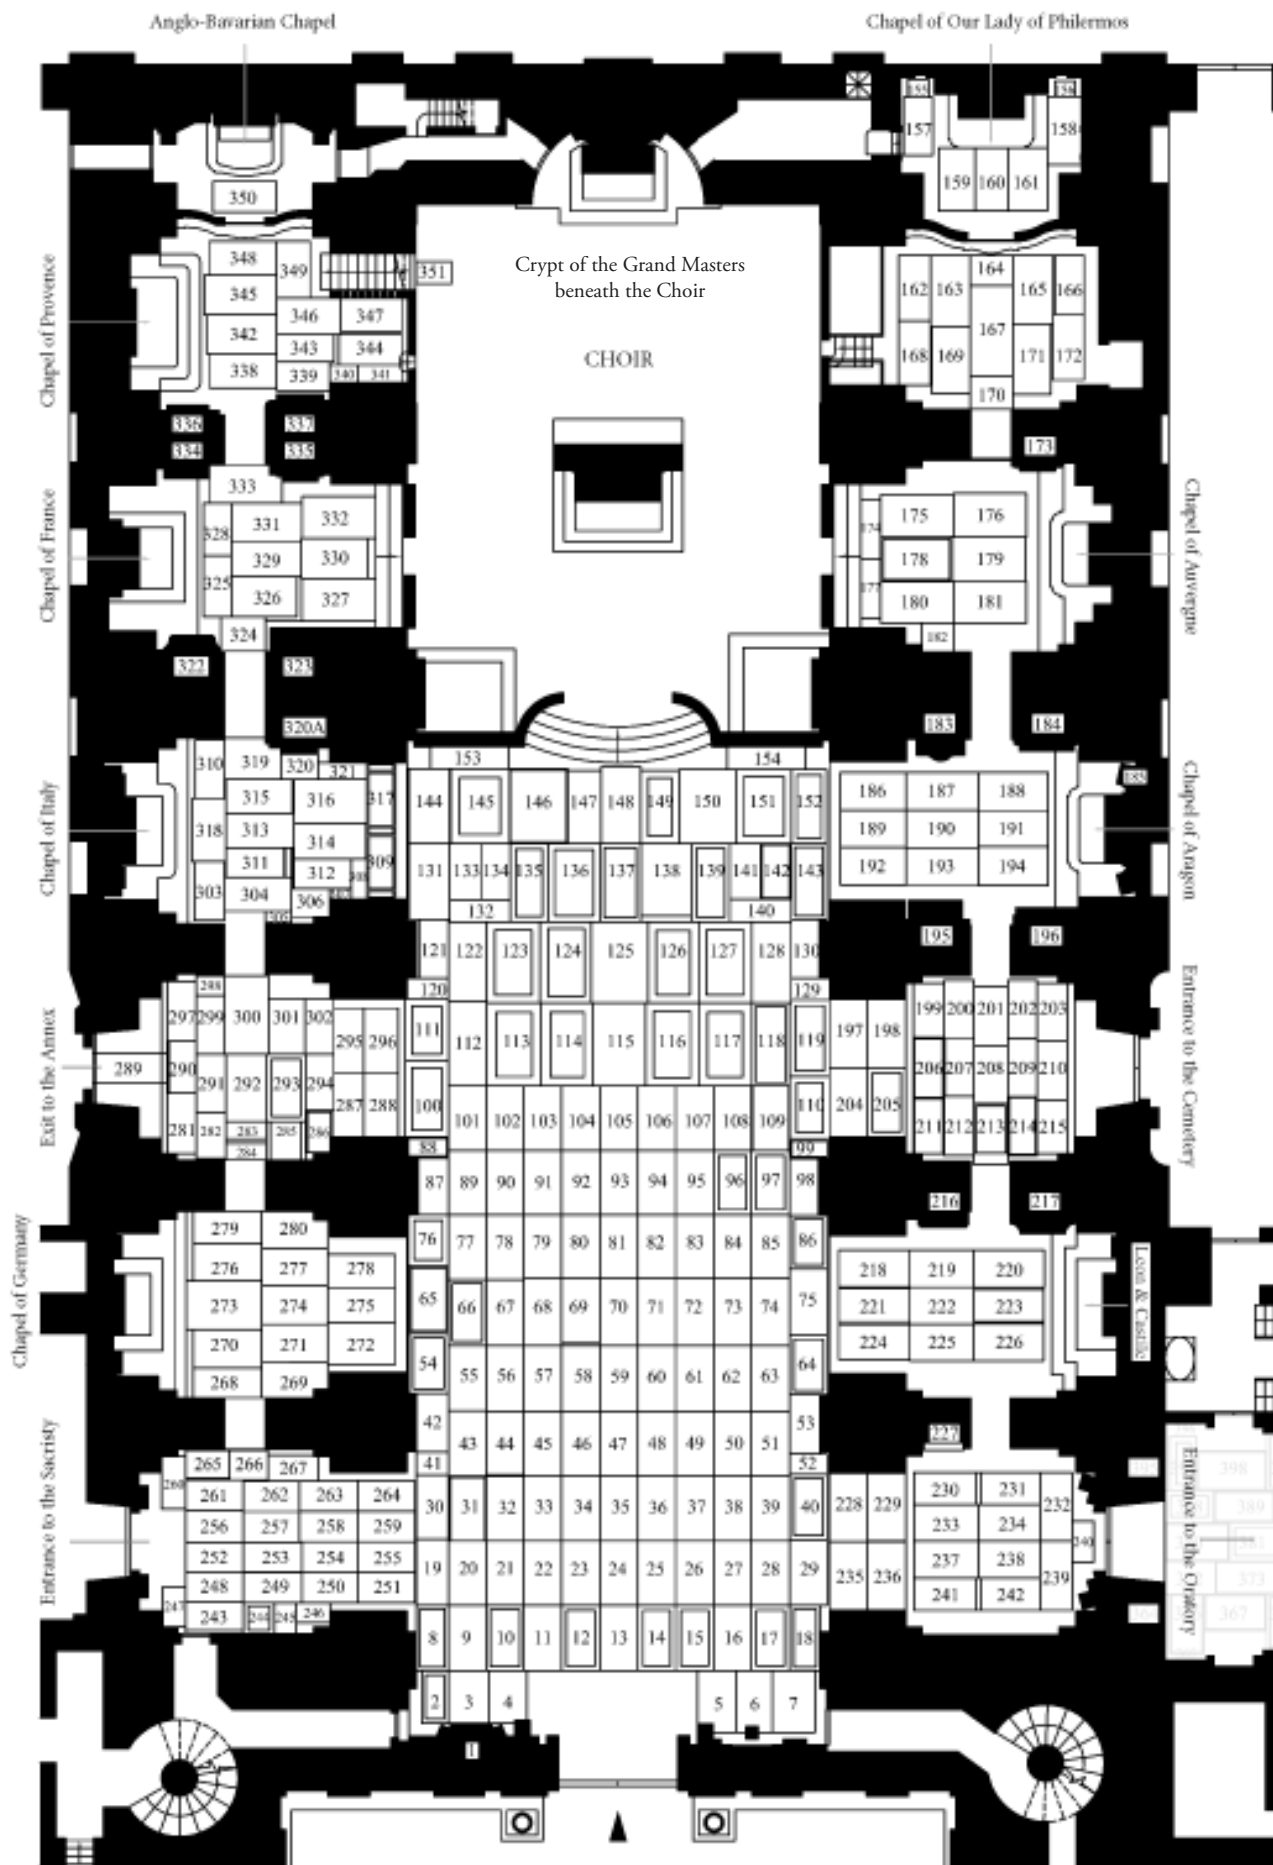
Floor plan of nave at St John's, with sepulchral slabs and monuments according floor plan numbering. Source: Munro, 2005.
